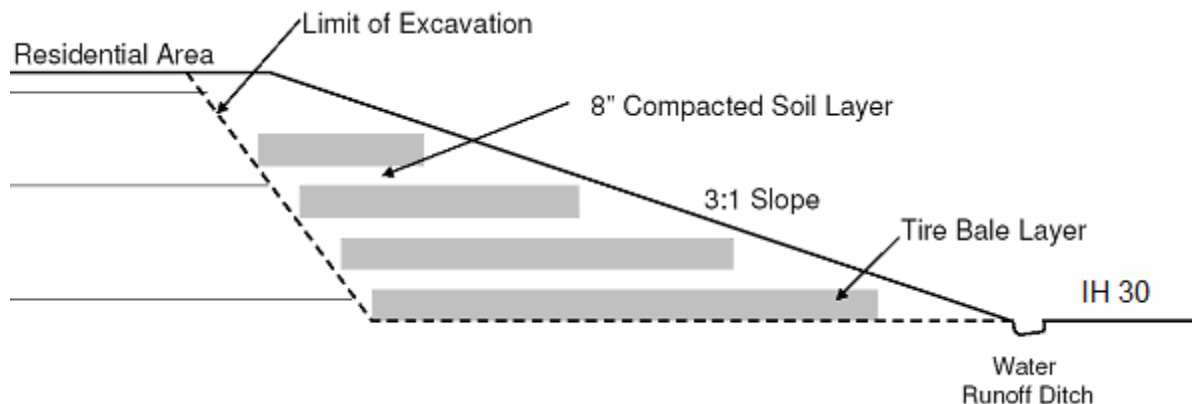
Tire Bale Reinforced Embankment Geometry
